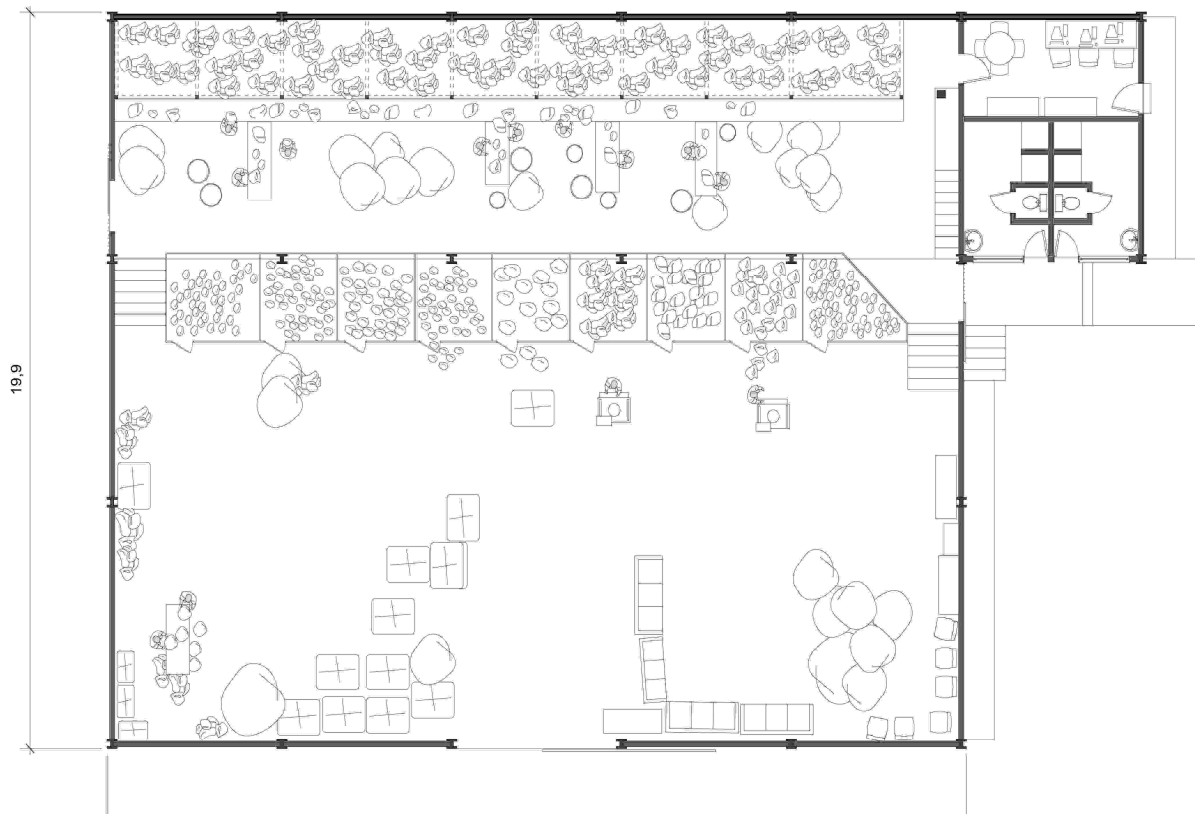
Floor plan of the waste recycling shed ARLAS, Canoas (RS). Drawing by Thiago Wondracek and Marcelo Heck
